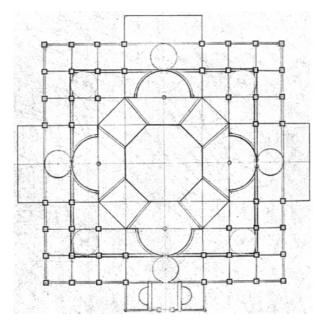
Drawing for a central plan church, Cod. Ashb. II, fol. 4 r; graphite on paper
